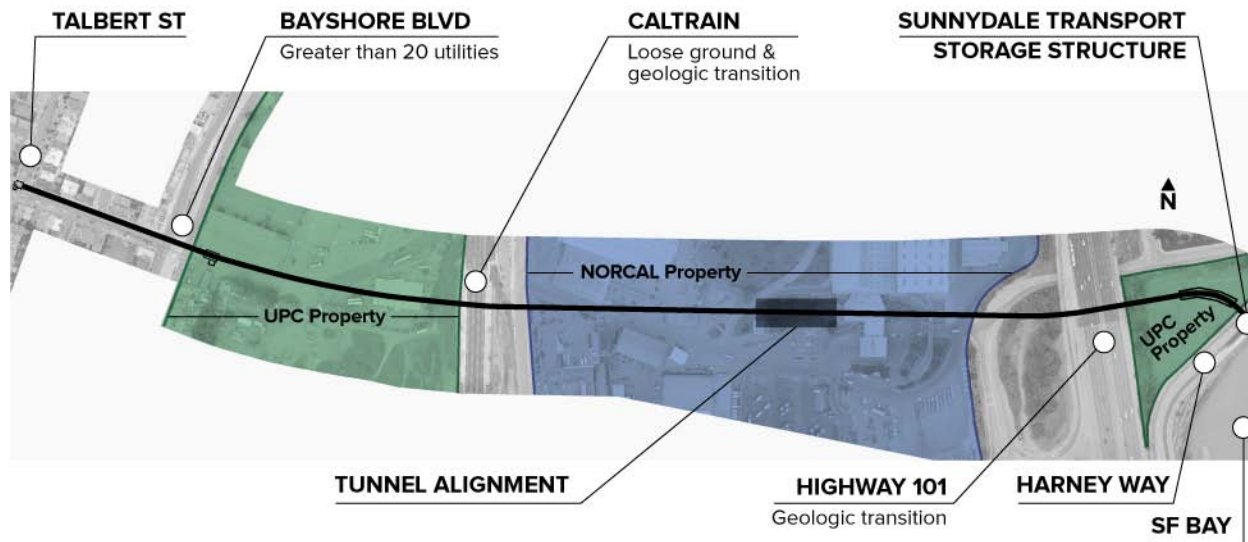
Phase 1 of the Sunnydale Auxiliary Sewer Tunnel alignment.
